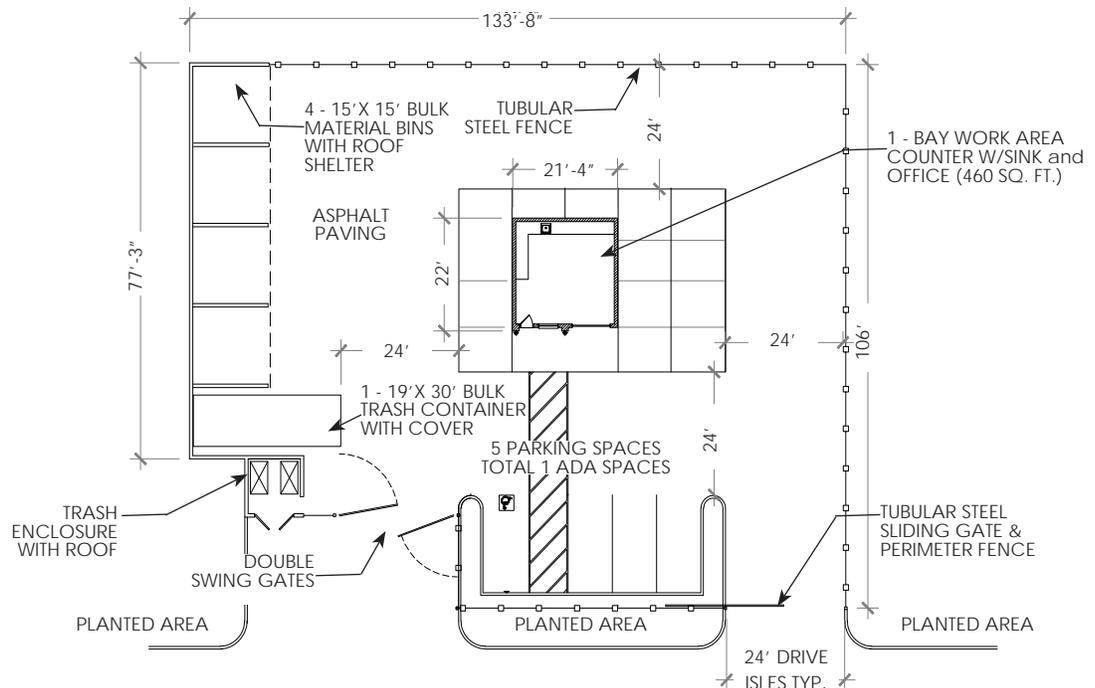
Preferred Small Maintenance Building and Yards Layout Diagram -
